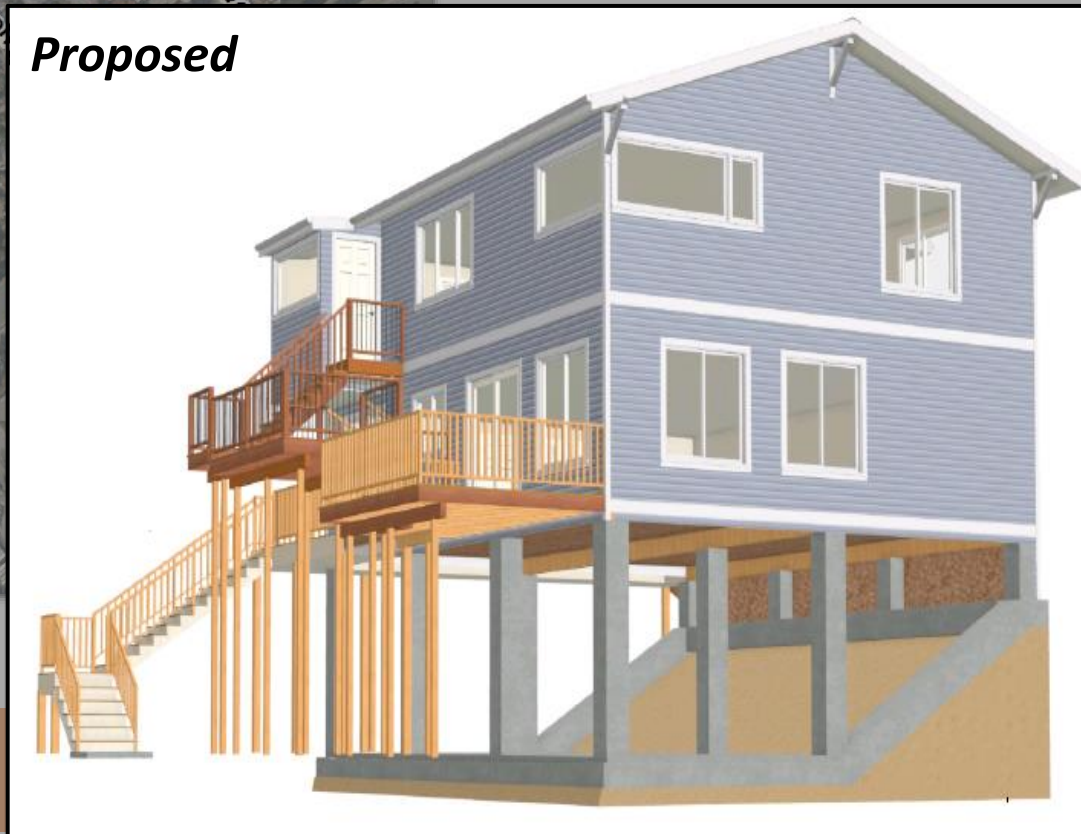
Rendering of home elevation – 48-50 South 17<sup>th</sup> Street, San Jose
